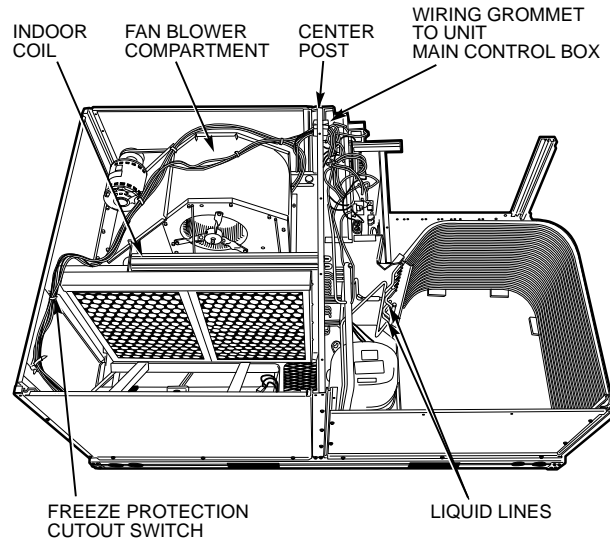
Typical Installation of Freeze Protection Cut-out Switch(es) (Single Compressor Unit Shown)
